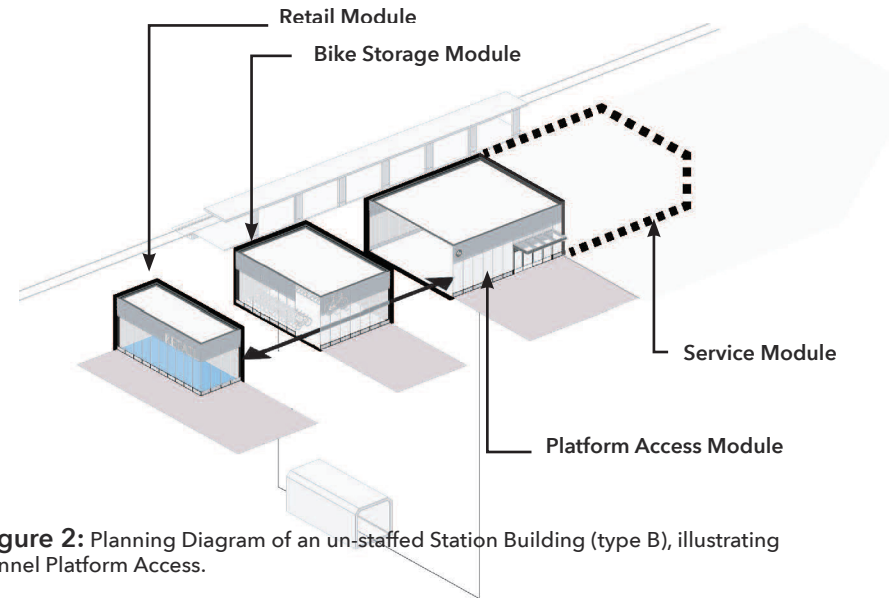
Planning Diagram of an un-staffed Station Building (type B), illustrating Tunnel Platform Access.
